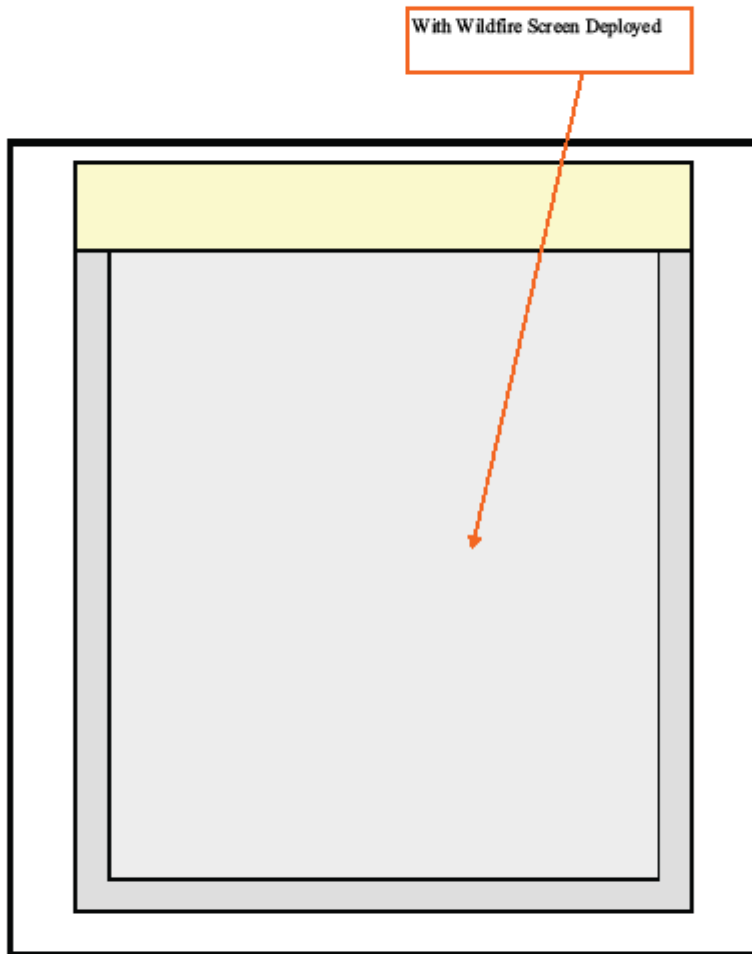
Assembly detail (Drawing supplied by test sponsor.)
